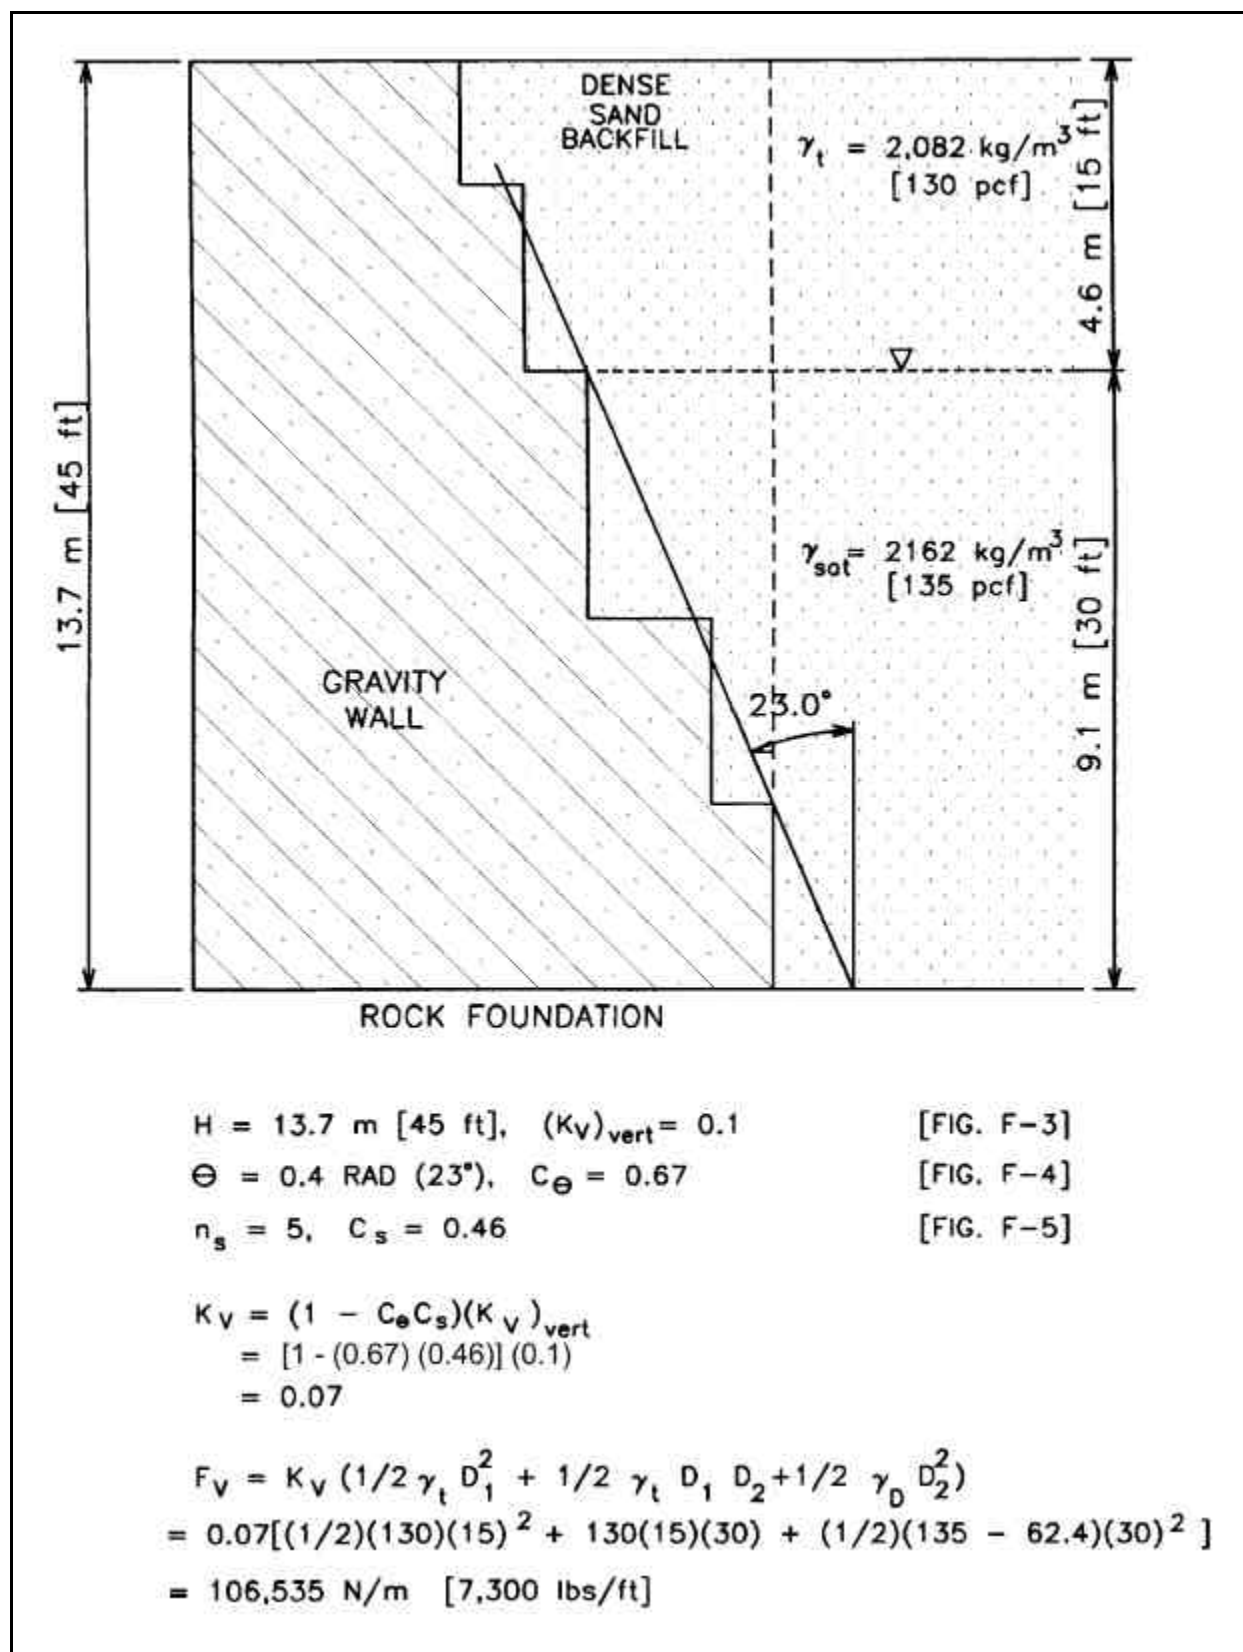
Example calculation of the vertical shear force for a gravity wall founded on rock
